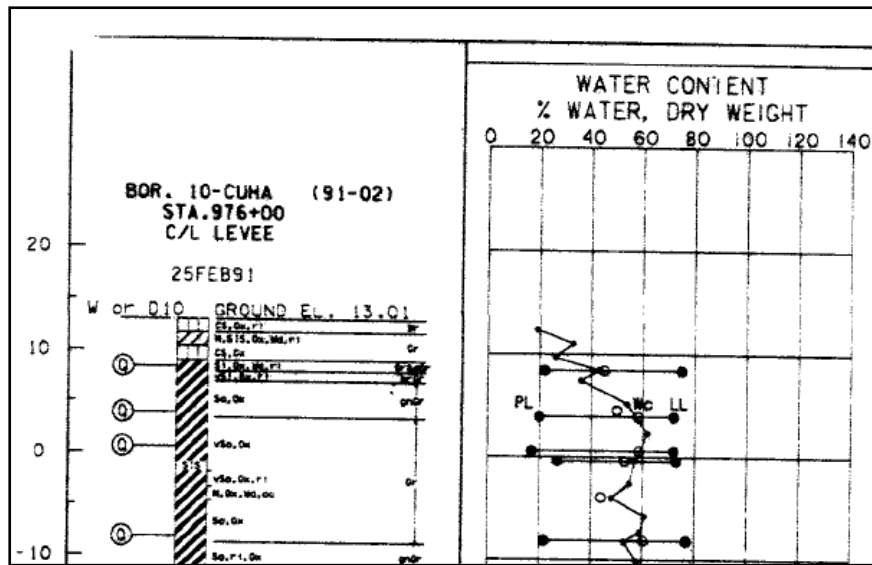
Boring 10-CUHA in the sheetpile reach. Note the soil layering typical of hydraulic fill.
